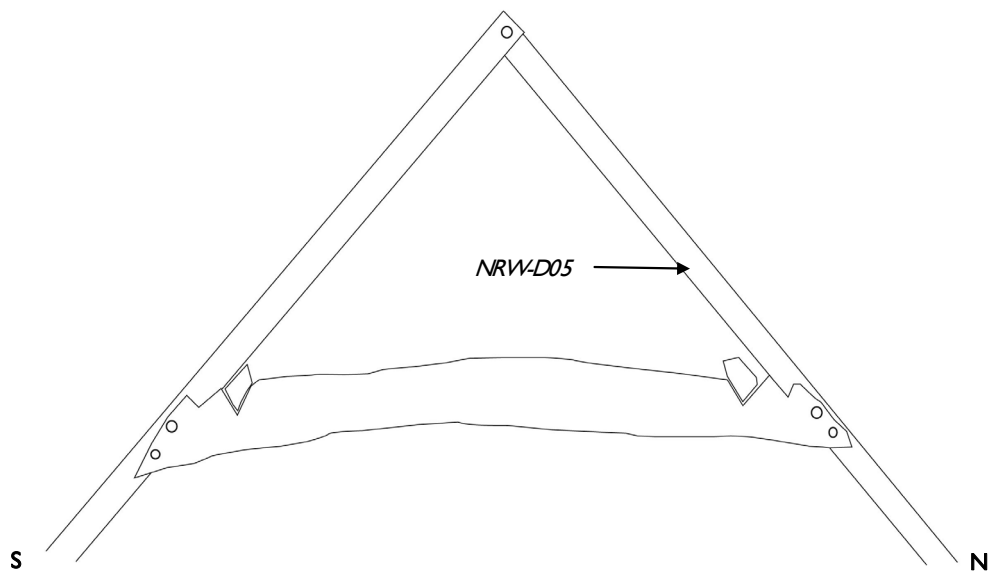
Location of sample on common rafter frame 16, viewed looking west
